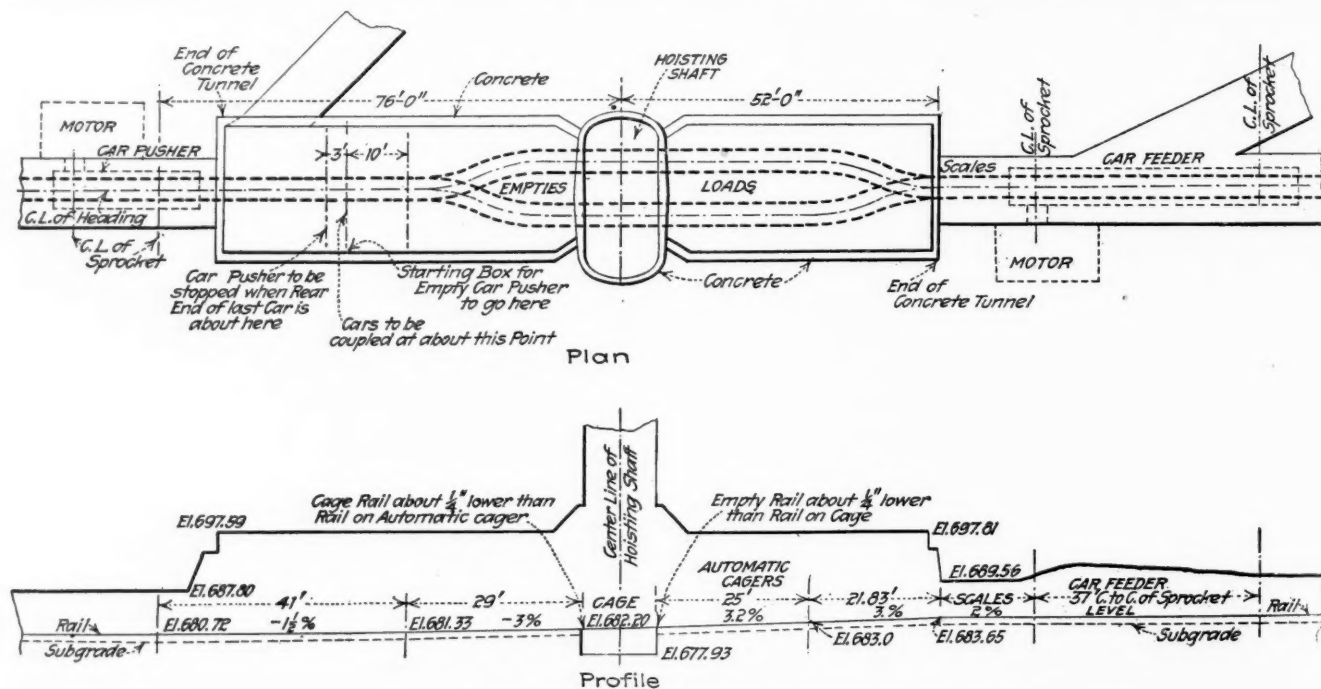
PLAN AND PROFILE OF THE SHAFT BOTTOM AT NO. 87 MINE
